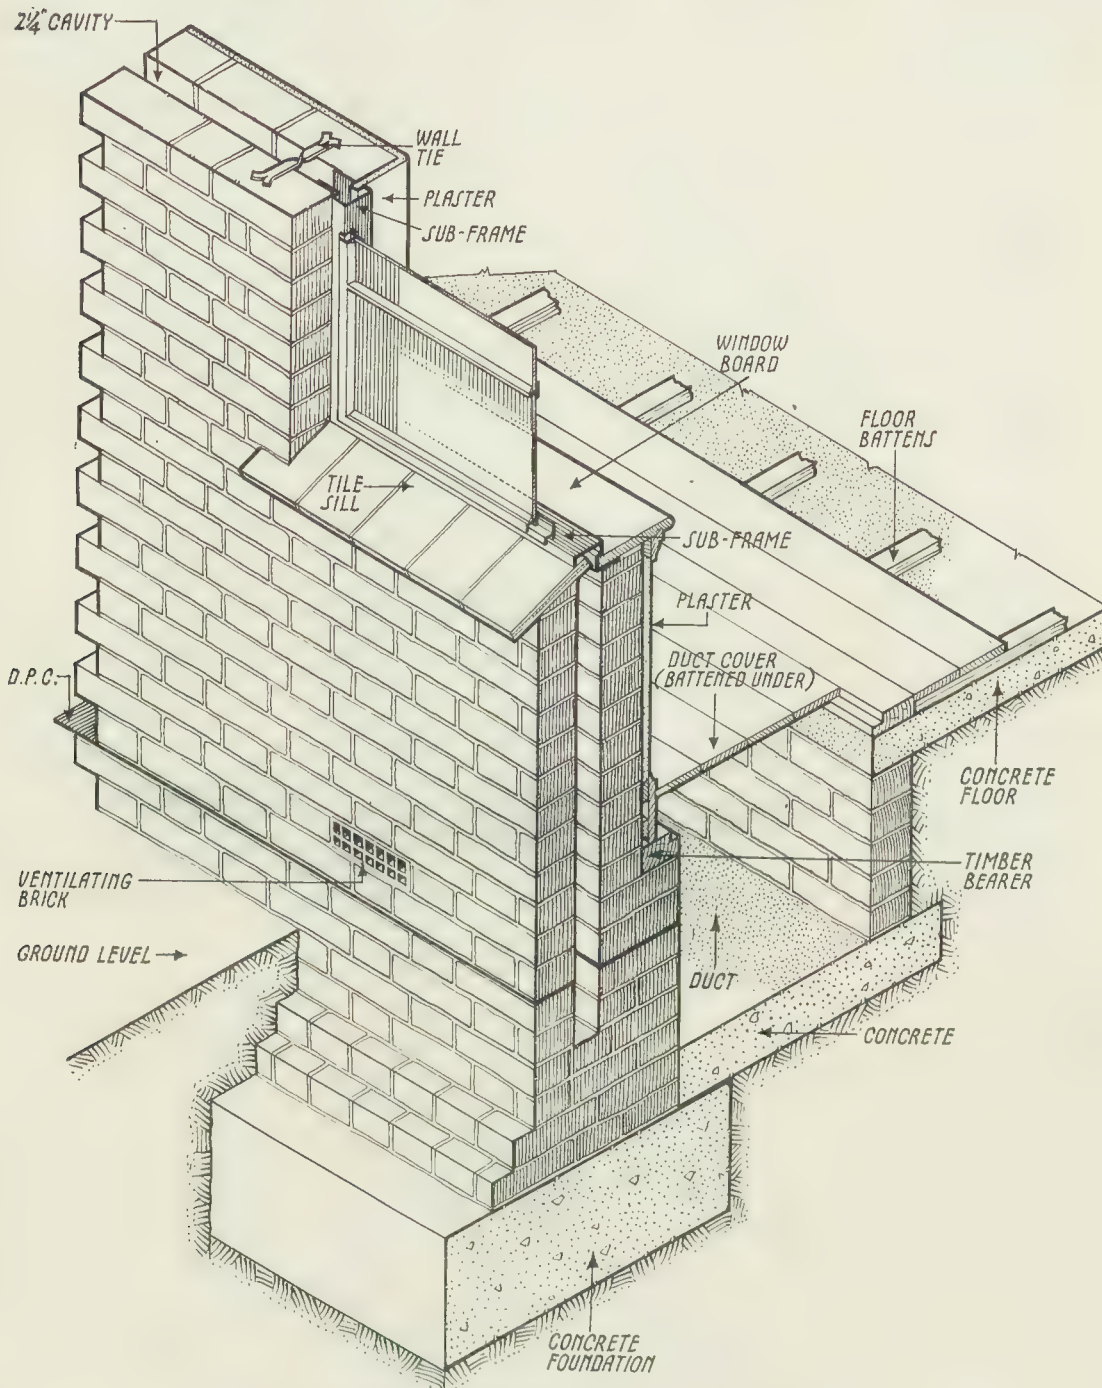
CONSTRUCTION AT THE BASE OF A BRICK CAVITY WALL
